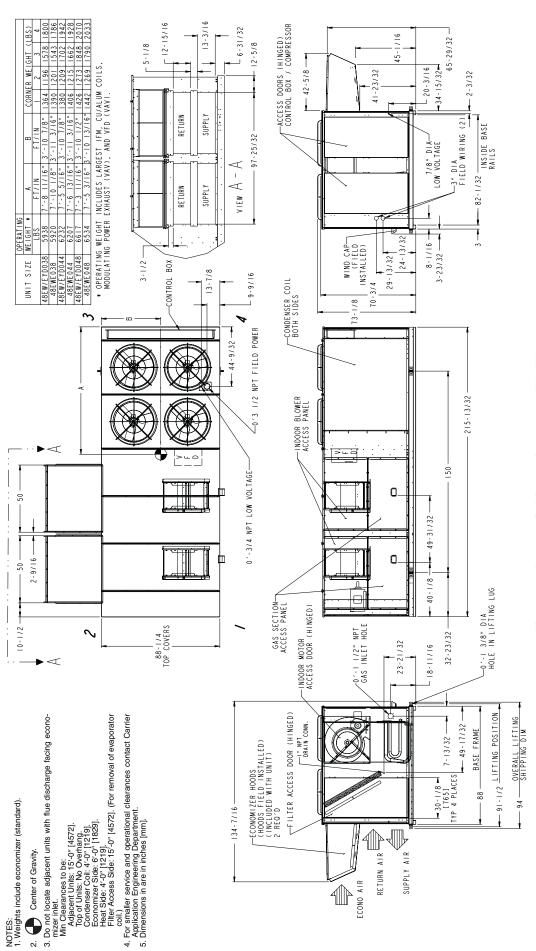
Base Unit Dimensions — 48EW,EY038-048
